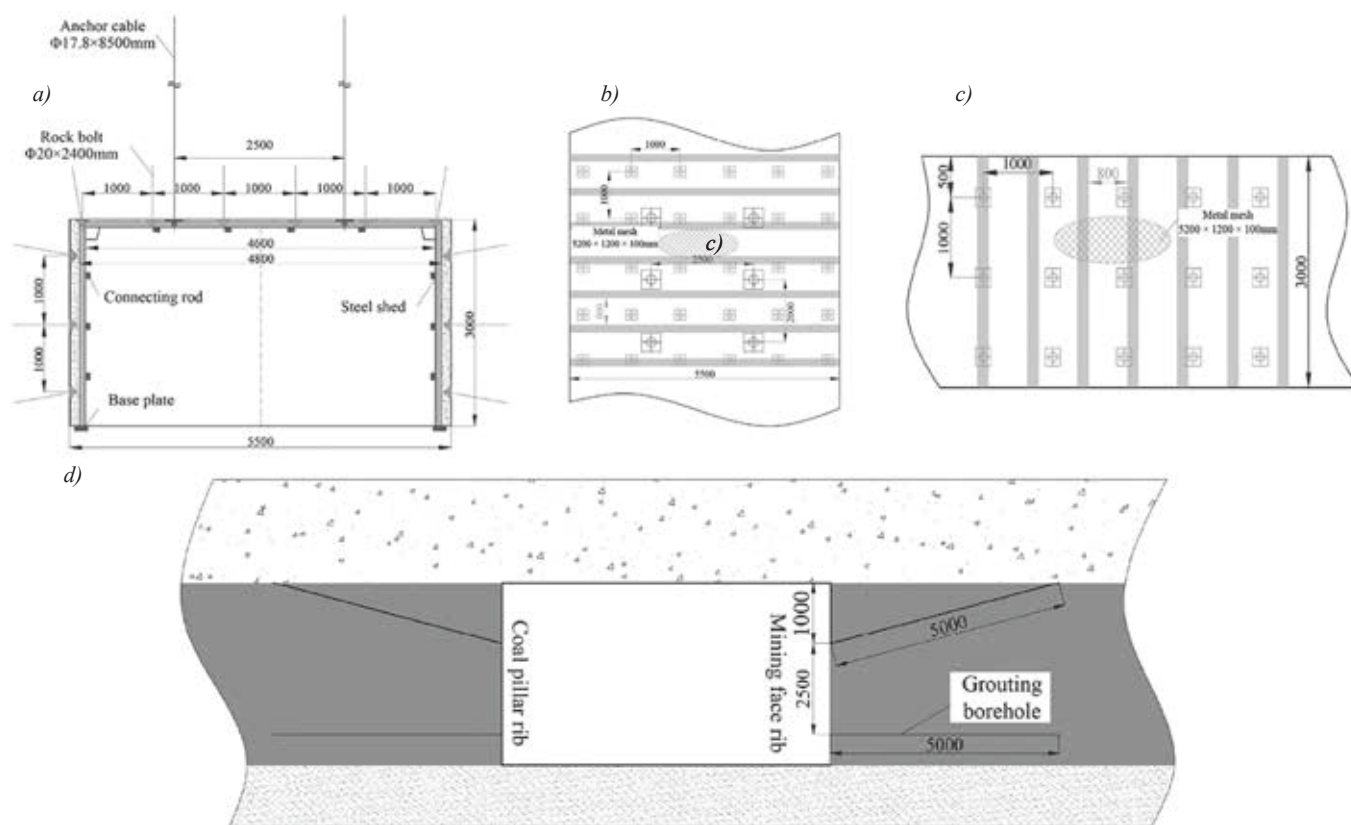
Combined support of roadway: (a) Support section (b) Roof support (c) Rib support (d) Grouting borehole layout
